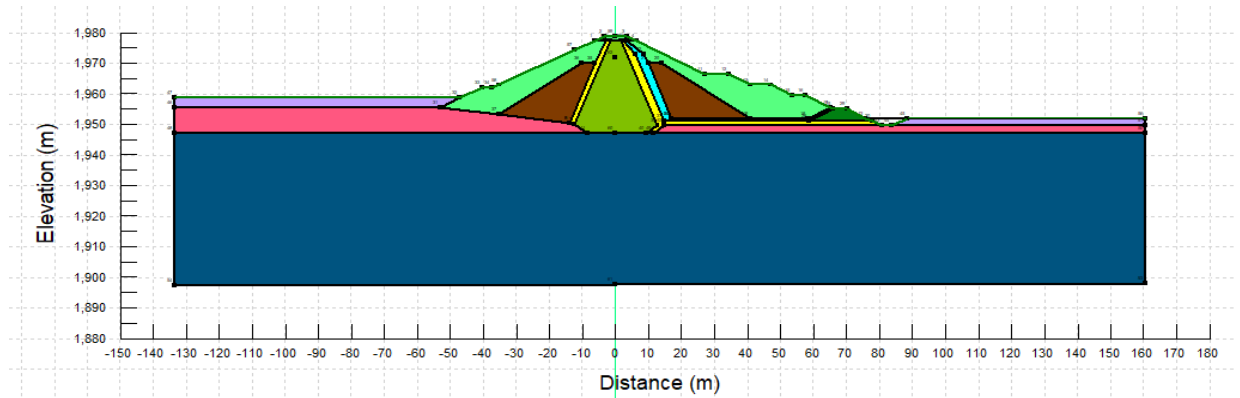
Dam Zoning for Zoned Earth-Rock Fill with Central Clay Core including foundation
